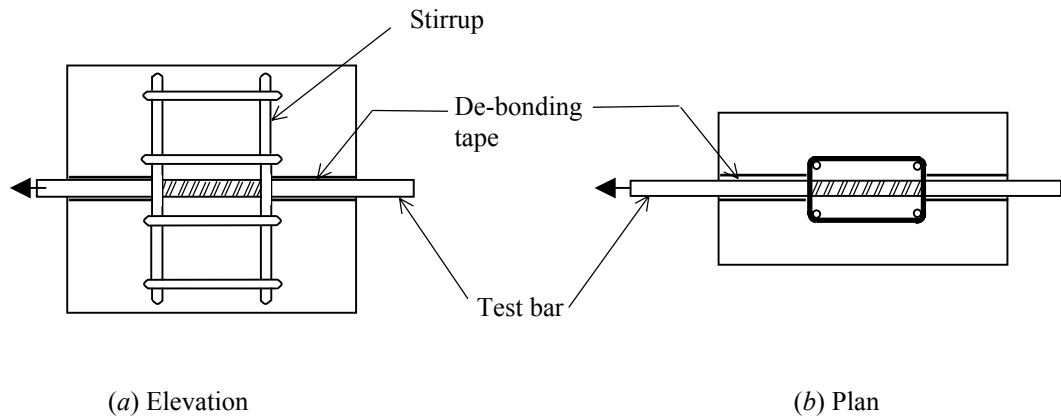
Arrangement of stirrups in test specimens used by Eligehausen et al. (1983) and Soroushian & Choi (1989)
